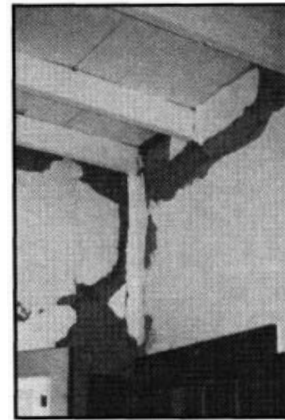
Pio Pico Adobe. Slippage of tapanco floorjoists relative to supporting wall.
